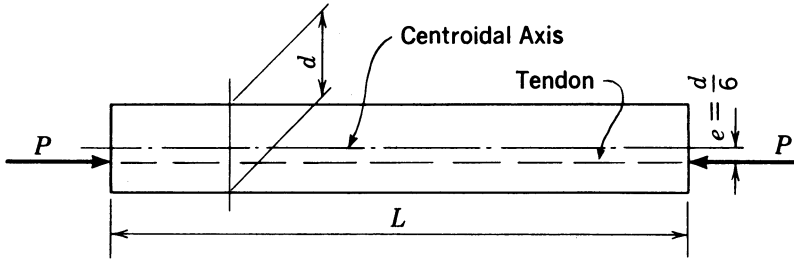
Simple rectangular beam prestressed by an eccentric straight tendon.
